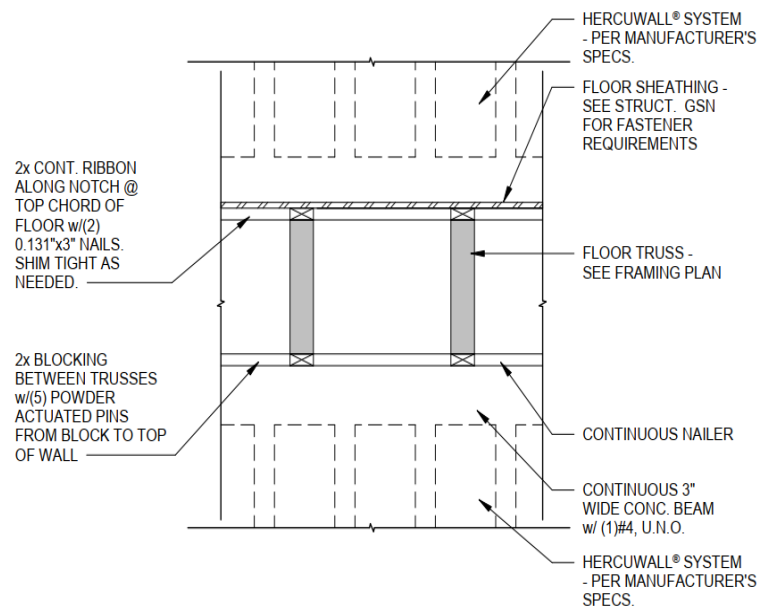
Typical HercuWall® CFC Box Beam Wall Construction with Lumber Embed
